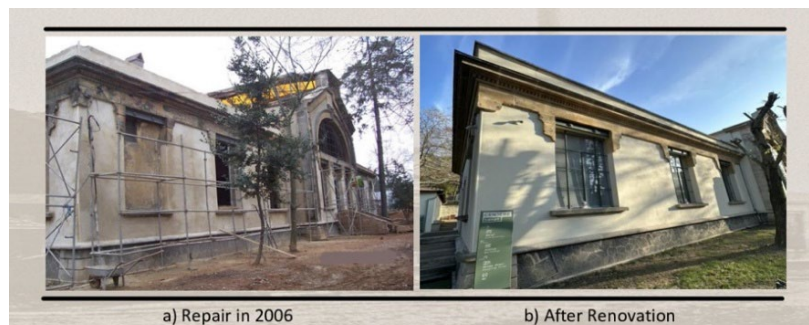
Cendere Art Museum facade renovation (Rena Construction, 2006. Photographed by authors)
